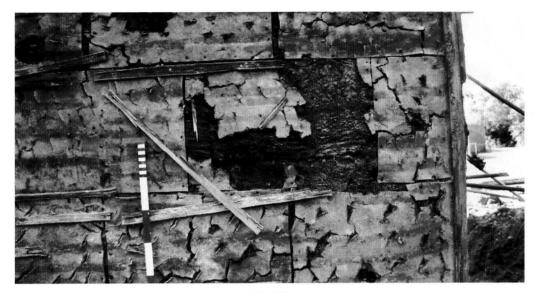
Paisley House, Oxford Detail of walling showing butted fireboard panels over tarred paper. The panels have been keyed to take a later render. Oxford Archaeological Unit
